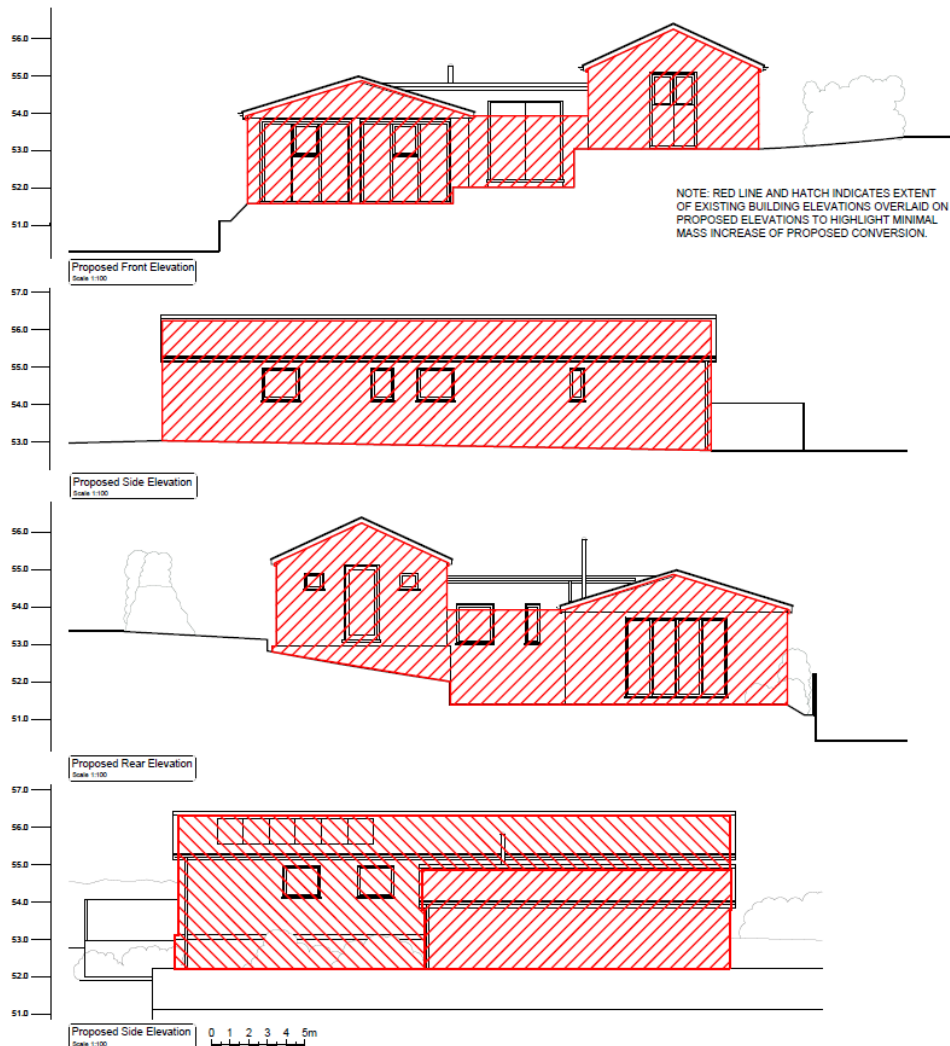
Comparison overlay elevations (existing building shown in red hatch)
